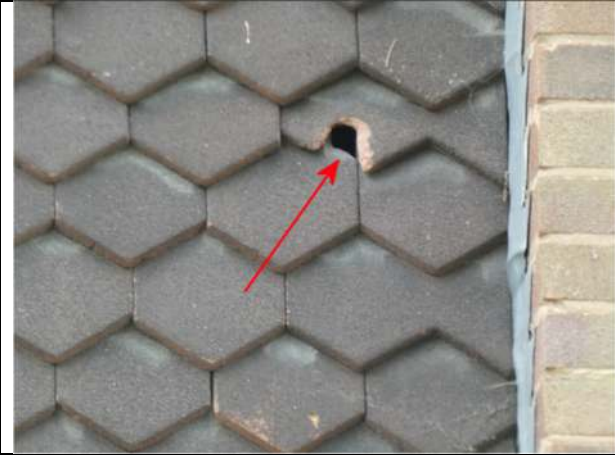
Opening in the hanging tiles on the east elevation of Nos 7 and 8
